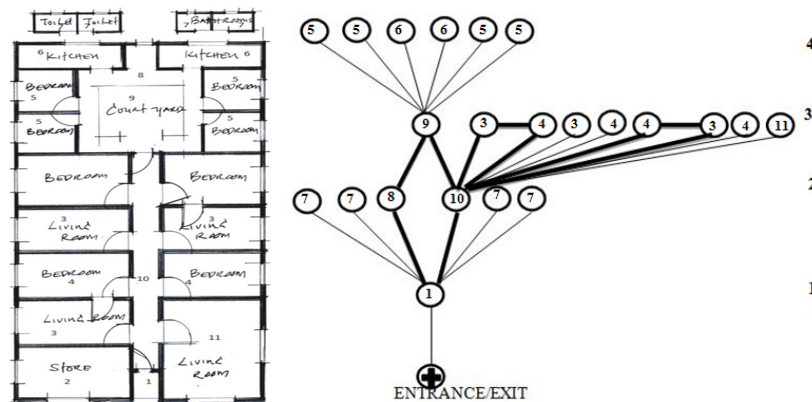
Floor plan and J-graph of a central corridor house (Source: Ekhaese 2011)
